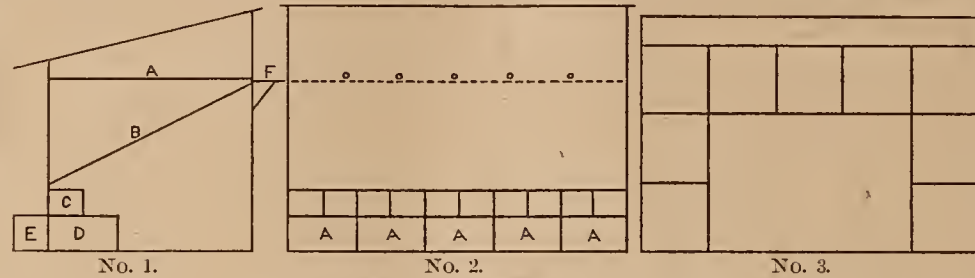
PLAN OF HOUSE FOR ONE FLOCK.
